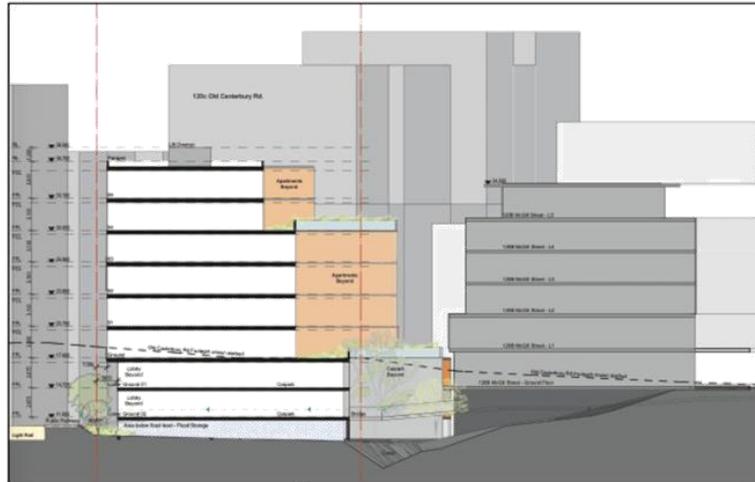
Indicative Section Through Building Massed to Old Canterbury Rd
